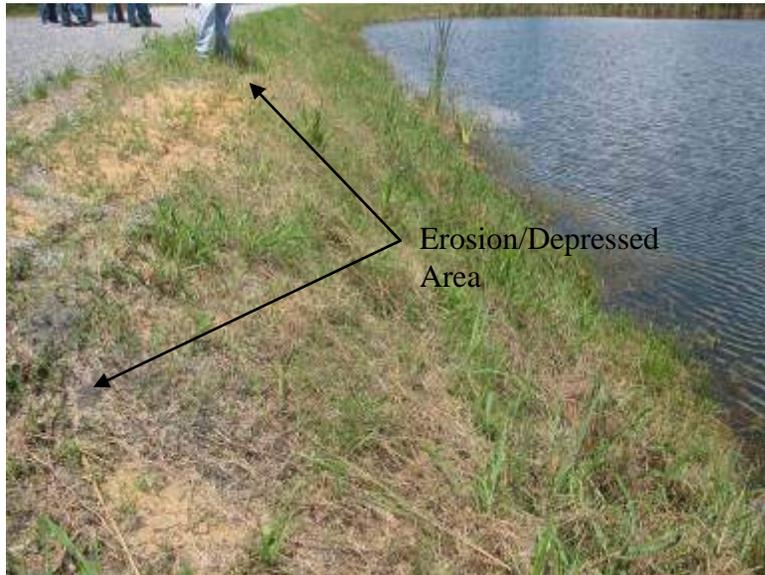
Upper West Pond – West embankment interior slope, showing erosion/depressed area approximately 30-foot long, looking north.
